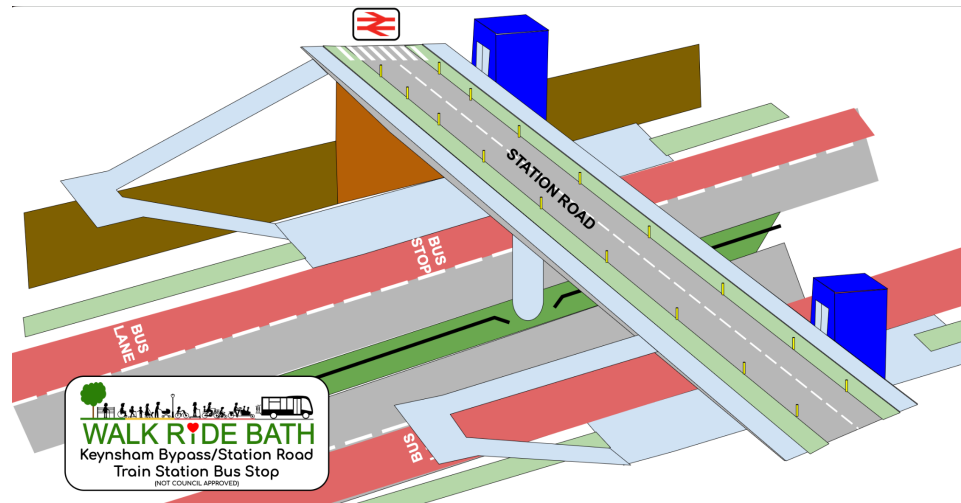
WRB illustrative concept for Station Road access, showing potential lifts and ramps to the bypass stops. Not to scale or council approved. Road layout, stop positions, gradients and structural works are illustrative and require assessment.
